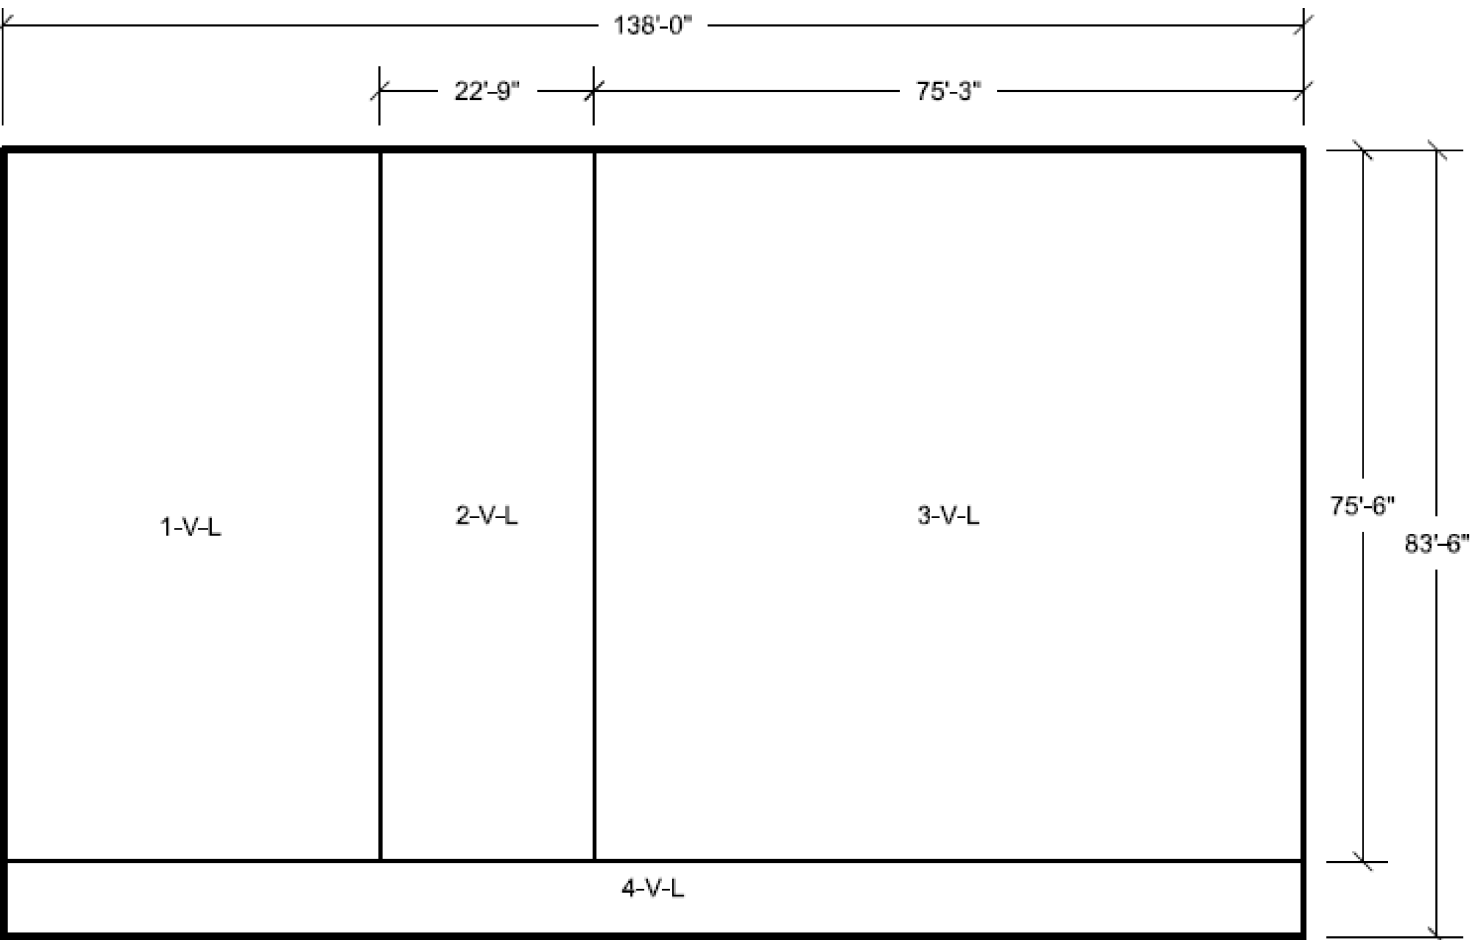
H.6-95 UHS Basin East Wall Looking West Vertical Reinforcement Zones Far Side Face
